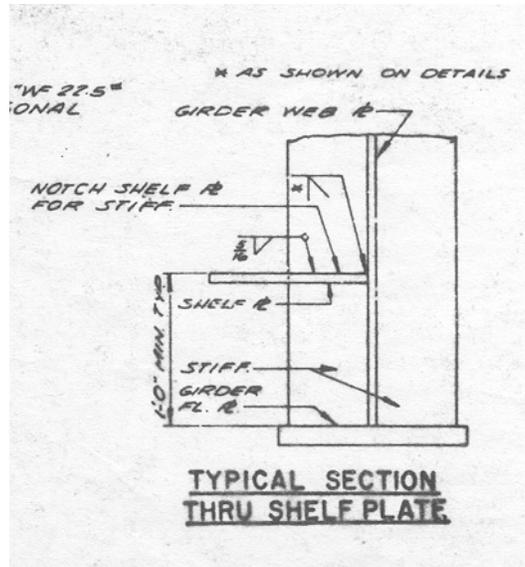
Shelf plate welded to girder web – welding detail (Bridge # 9320)
